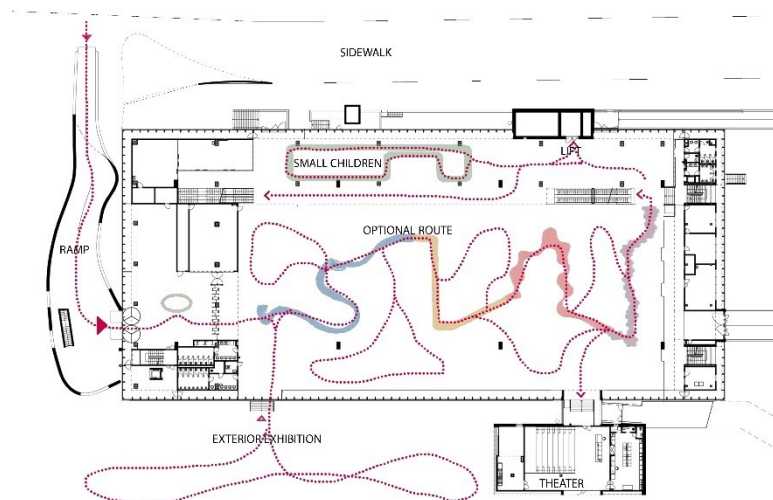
VIDA! Science Centre in Brno, Czech Republic: Ground Floor. (Source: Floor plan by K4 with markings by Filová, 2021)
